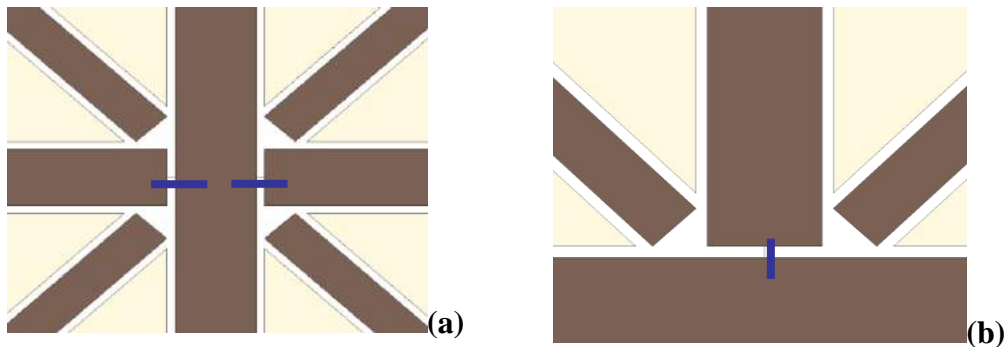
Nailed connections a) secondary horizontals b) secondary columns
